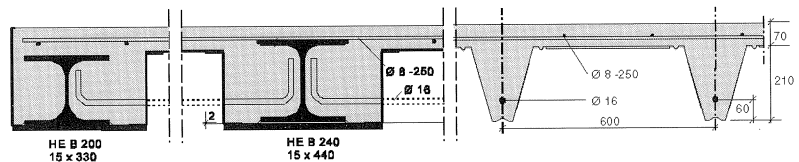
Cross section of the beams and the slab in the first structural fire test.
